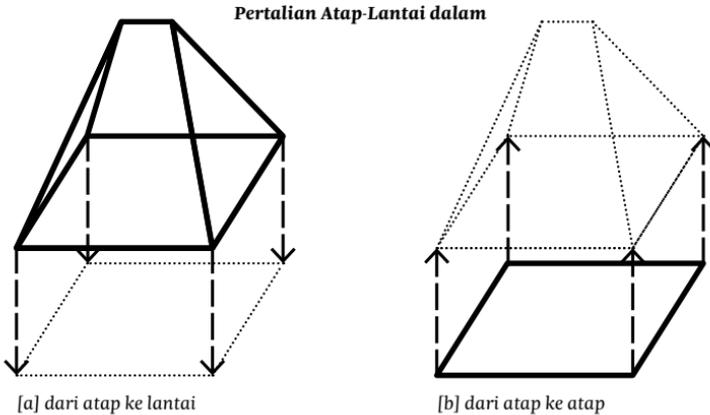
[a] from roof to ground floor; [b] from ground floor to roof
